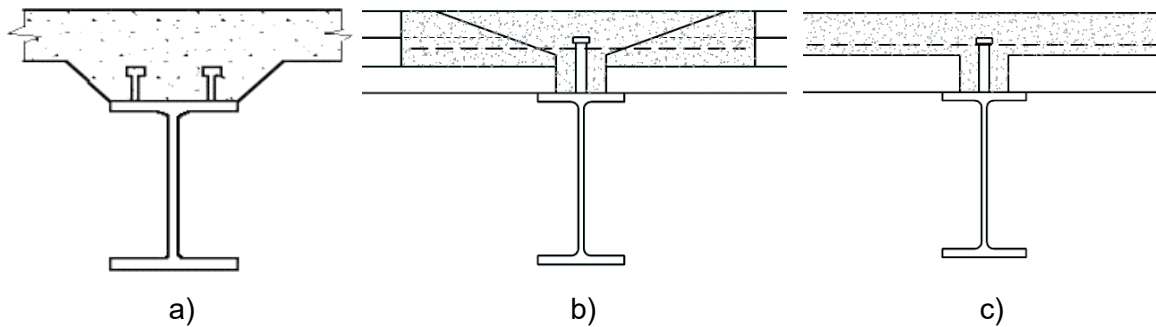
Welded headed studs applied as shear connectors in profiled decking system (a), hollow core sections (b) and solid slab with topping (c) [5]
